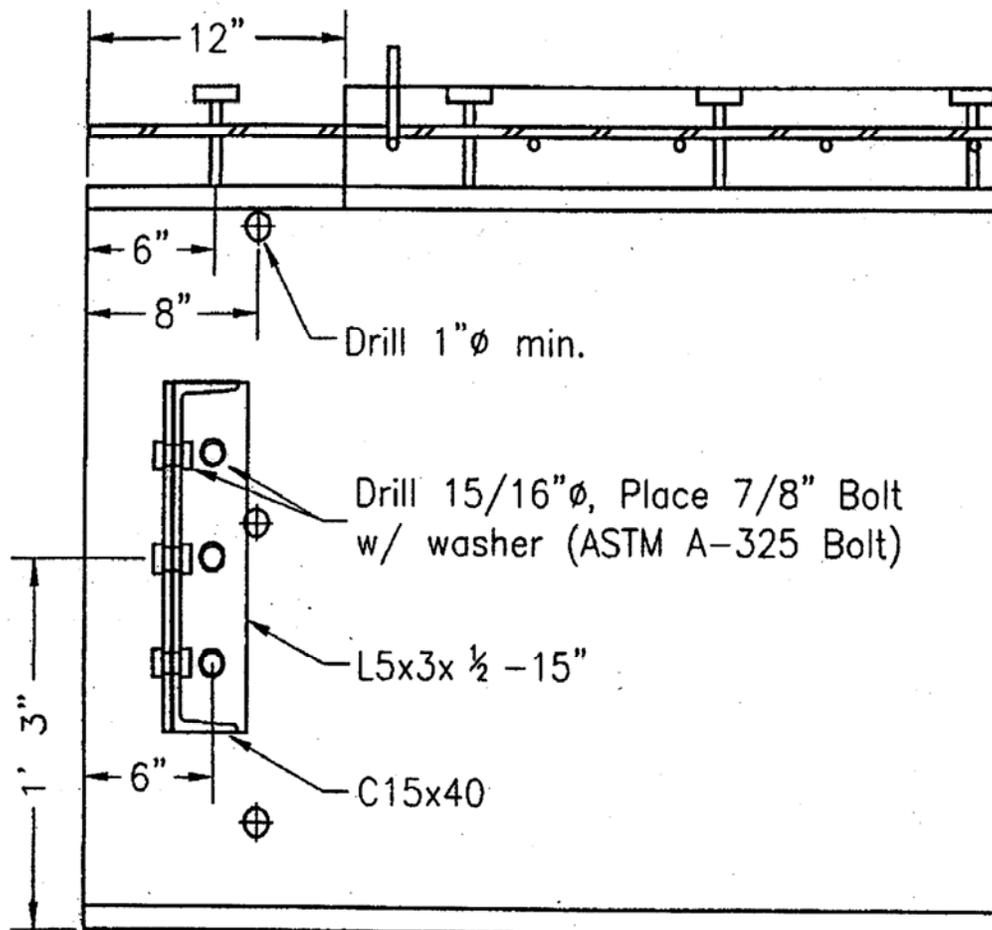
Steel beam profile showing location of continuous transverse reinforcement.
